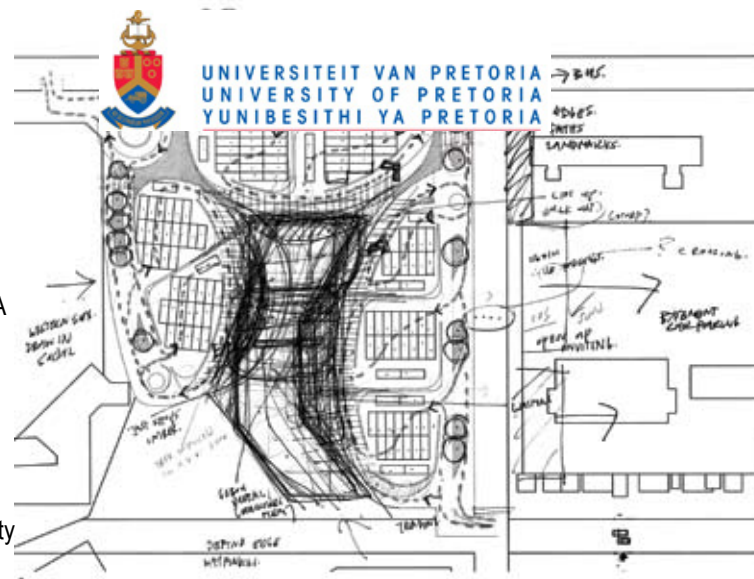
THIRD DESIGN ROUTE PLAN DIAGRAMS
